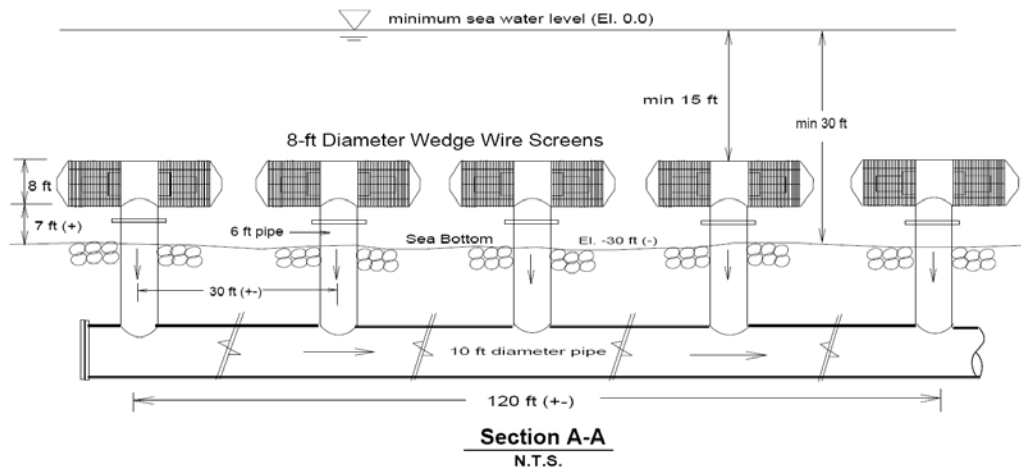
Sectional View of Wedge Wire Screen Intake Modular Assembly (Alternative B)
